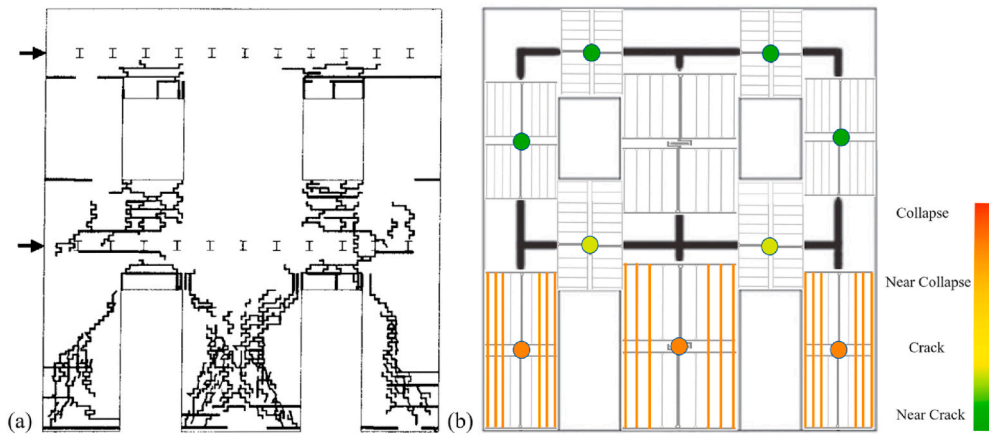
(a) Crack patterns of the Pavia door wall at the end of the test, and (b) damage representation of the wall modeled with the DM-MVLEM.
